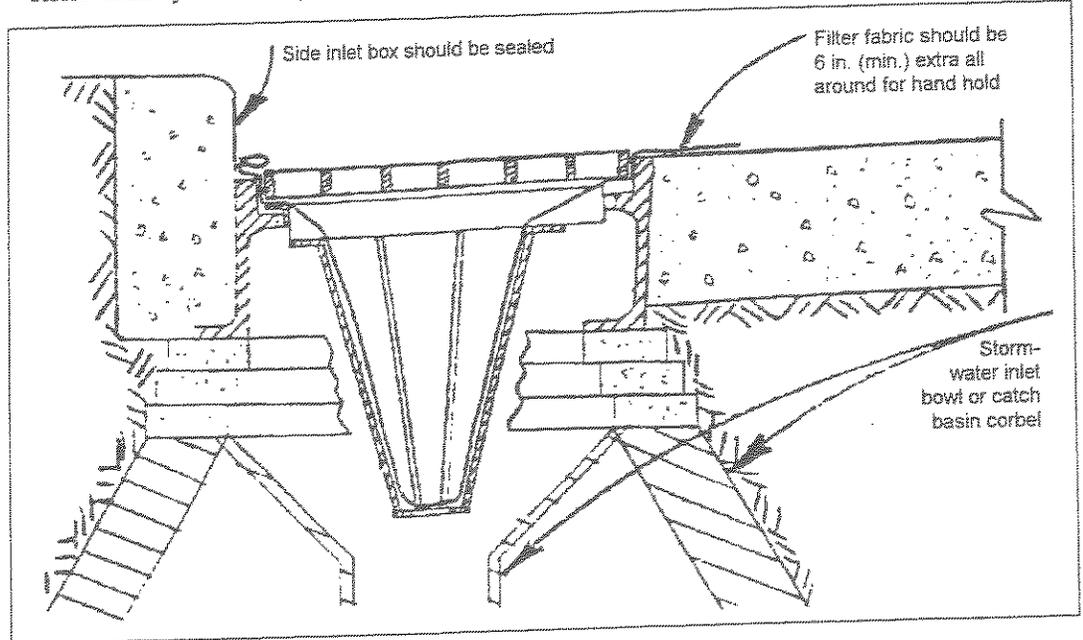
A. Cross-sectional view of a basket curb inlet protection.
